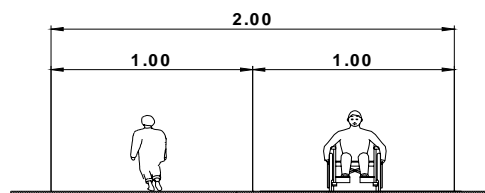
MINIMUM REQUIREMENT FOR WALK WAY (PEDESTRIAN WAY)
